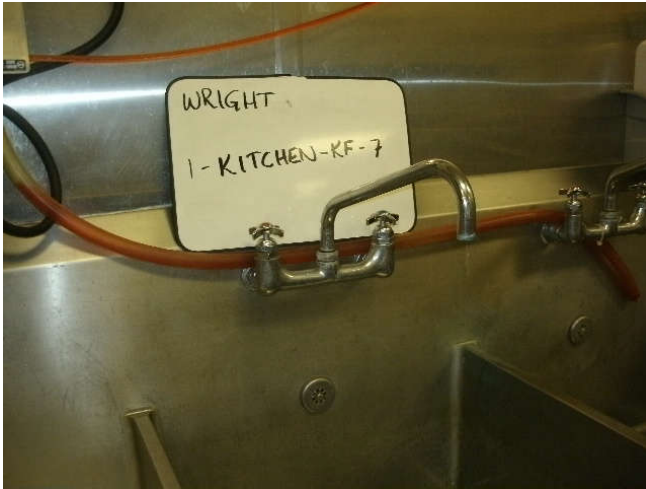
Kitchen faucet, located on the 1st floor in the kitchen against the wall – center fixture (dish washing).
